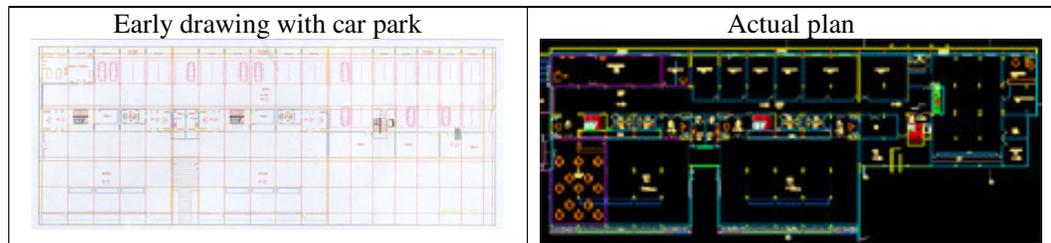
Plans of Silver Blocks (*Source: Archive of Teknopark Inc.*)
